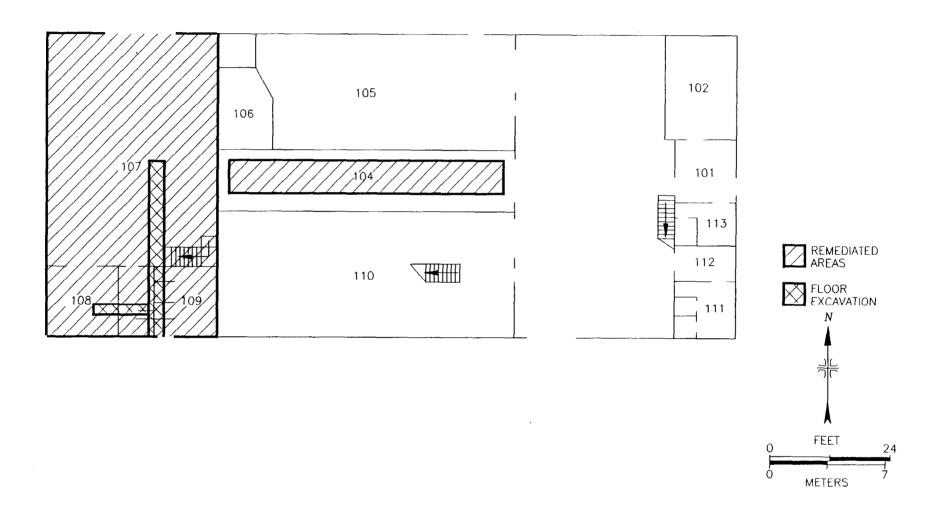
Layout of First Floor, Building 4, Indicating Locations of Remedial Action
